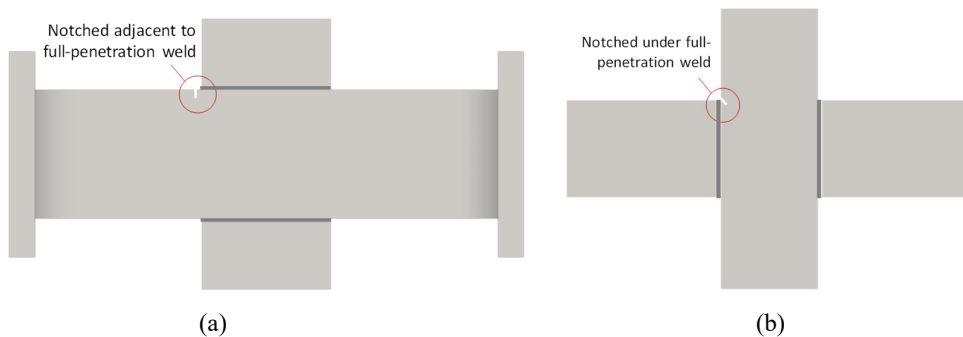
Notch location for (a) full-scale specimen and (b) half-scale specimen.
